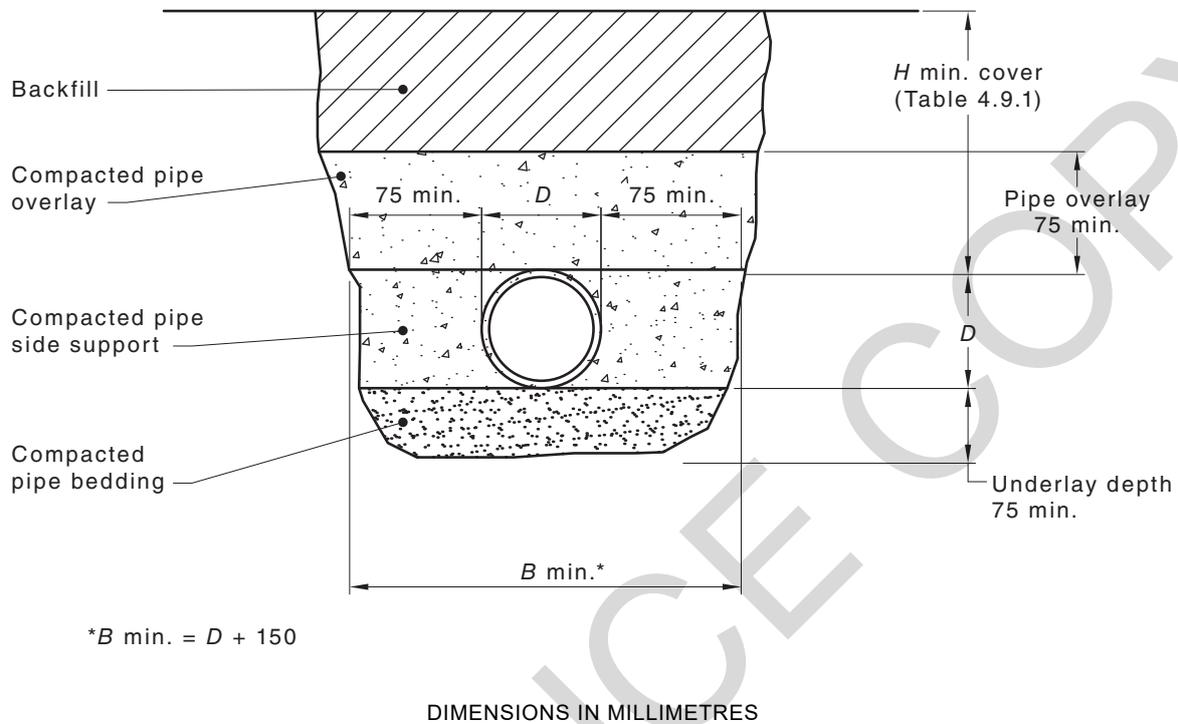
TYPICAL INSTALLATION IN A TRENCH
